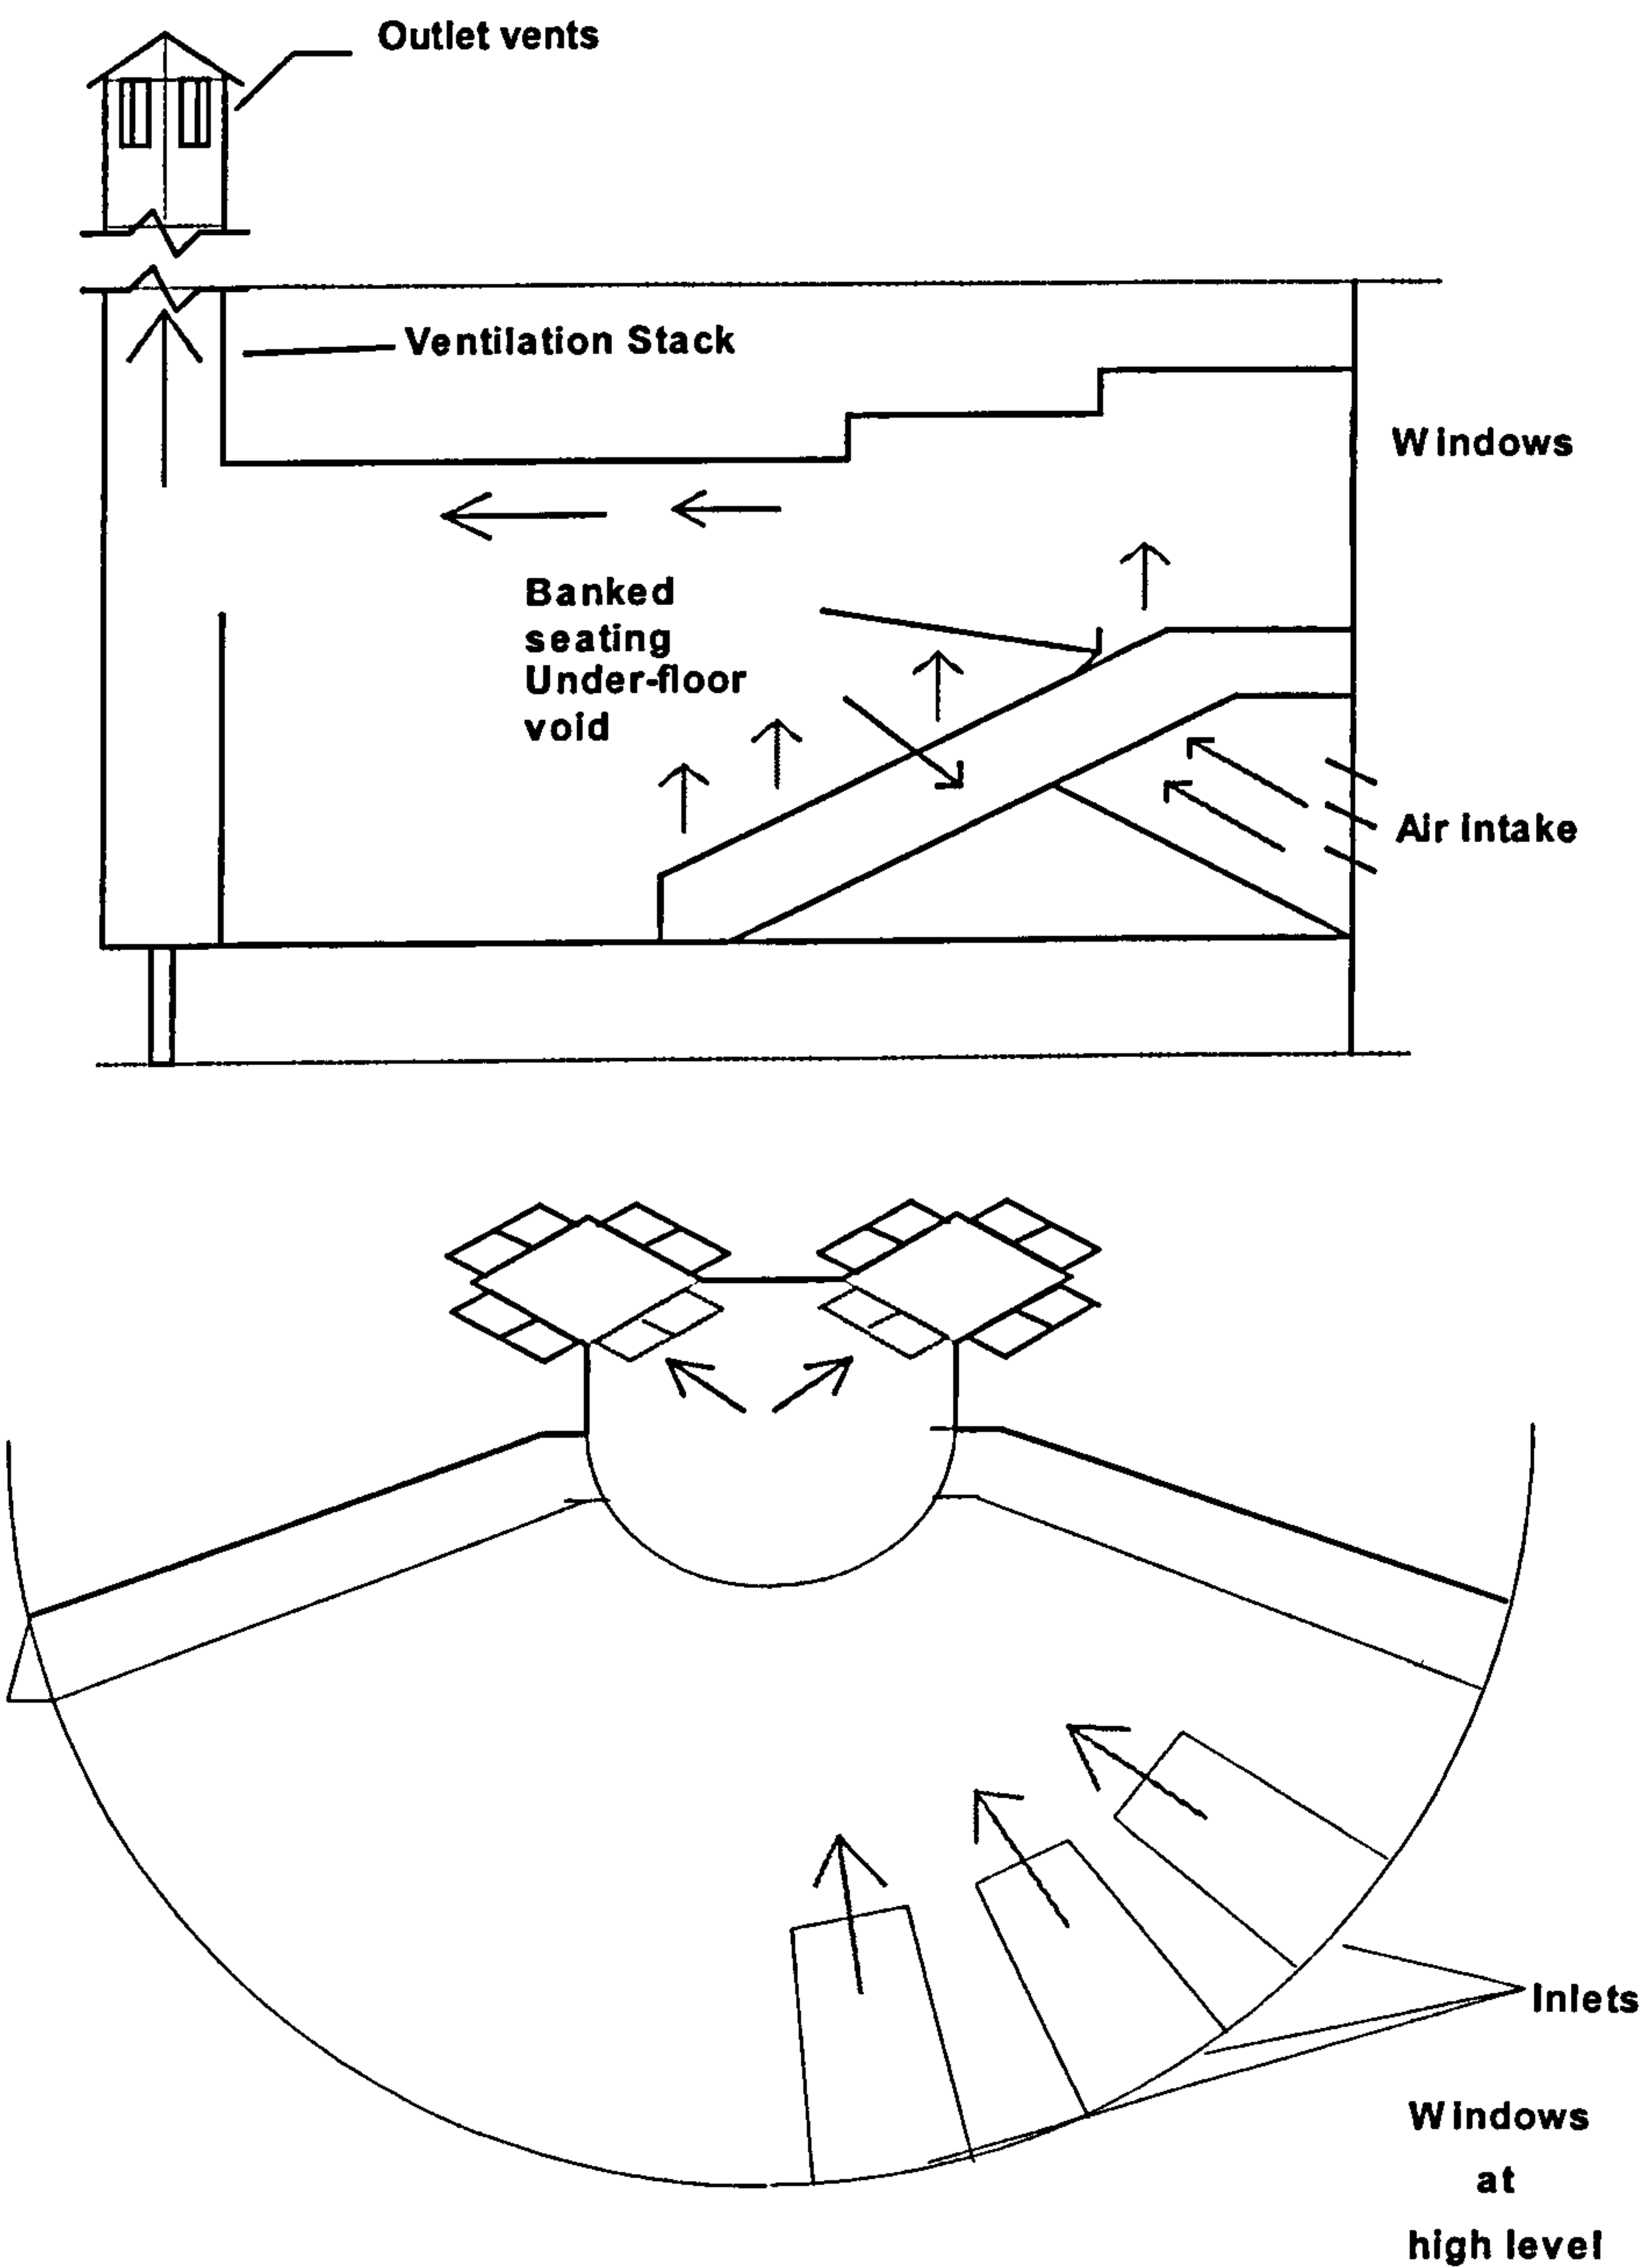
Section and plan of auditorium showing positions of inlets and outlet vents.
